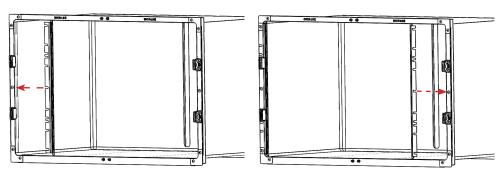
Left Jamb Seal Installation FIGURE 2.16 - Right Jamb Seal Installation
